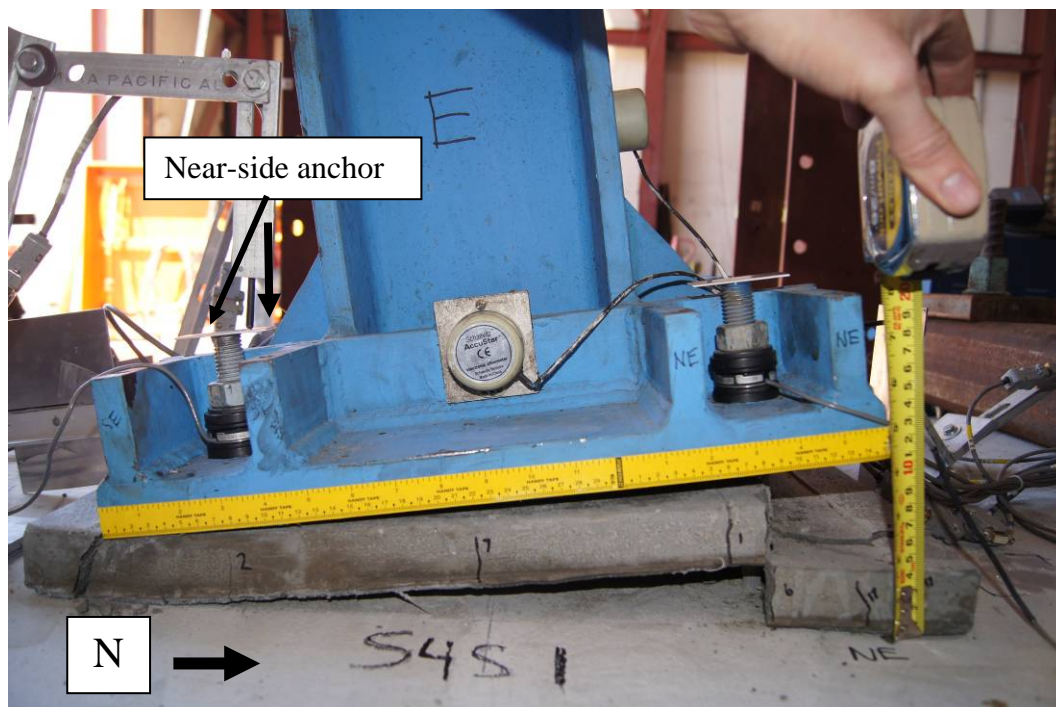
Test S4S1 at failure showing near-side anchor engagement
